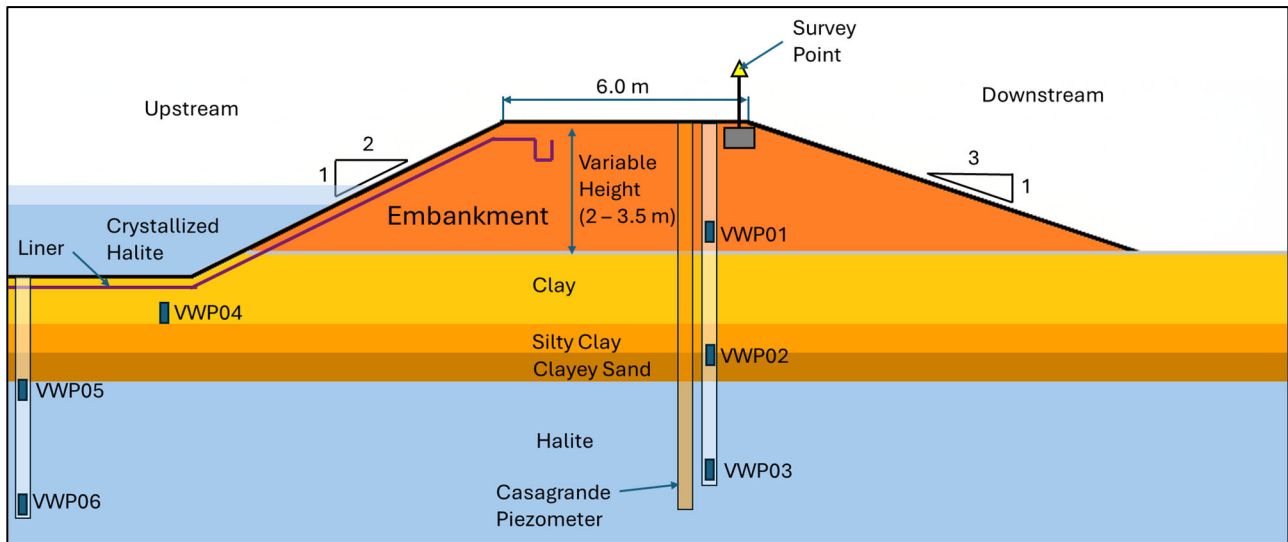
Typical cross section showing ground model, dam geometry, liner, and instrumentation.
